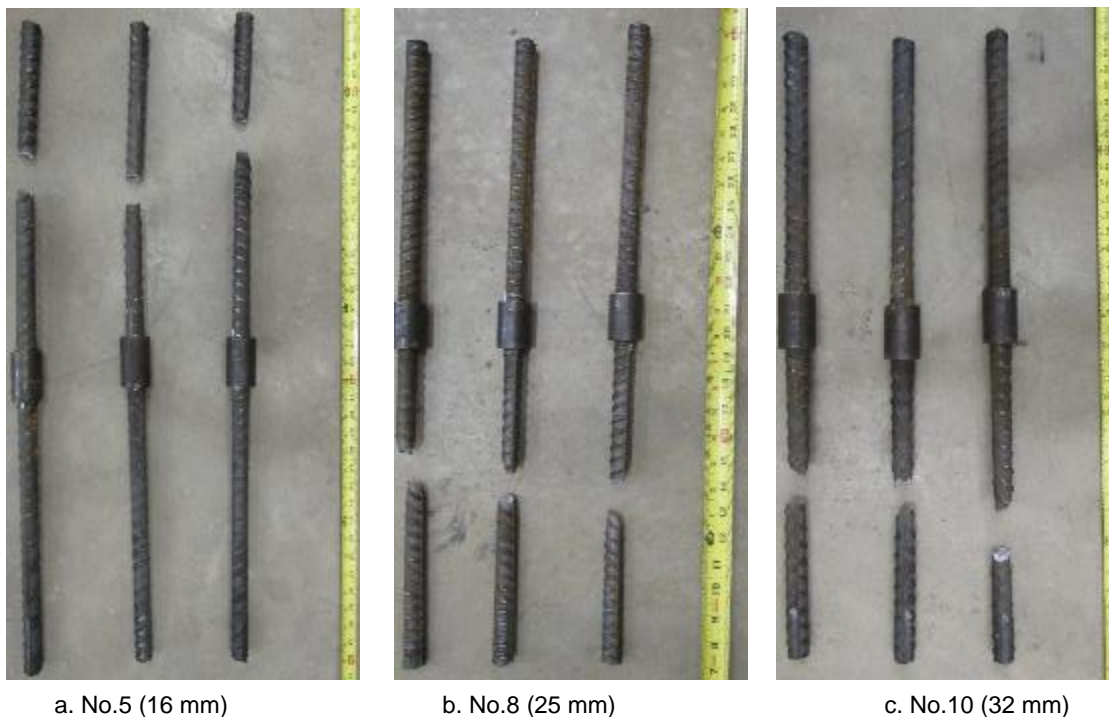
Failure of threaded couplers (Type A) under cyclic loading
